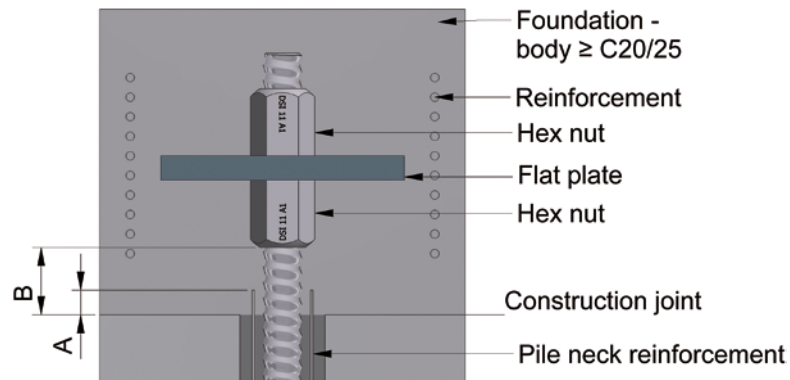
Anchor head detail with splitting tension reinforcement for alternating tension and compression loading (source: DSI Underground)
